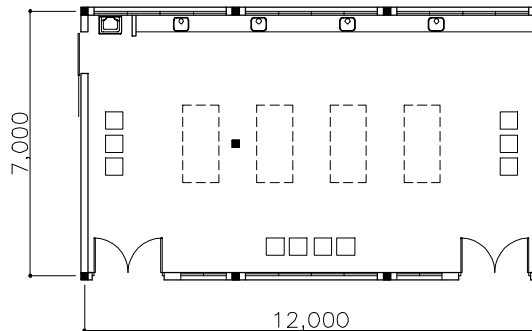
Floor Plan for Nursing Course Practical Training Room
